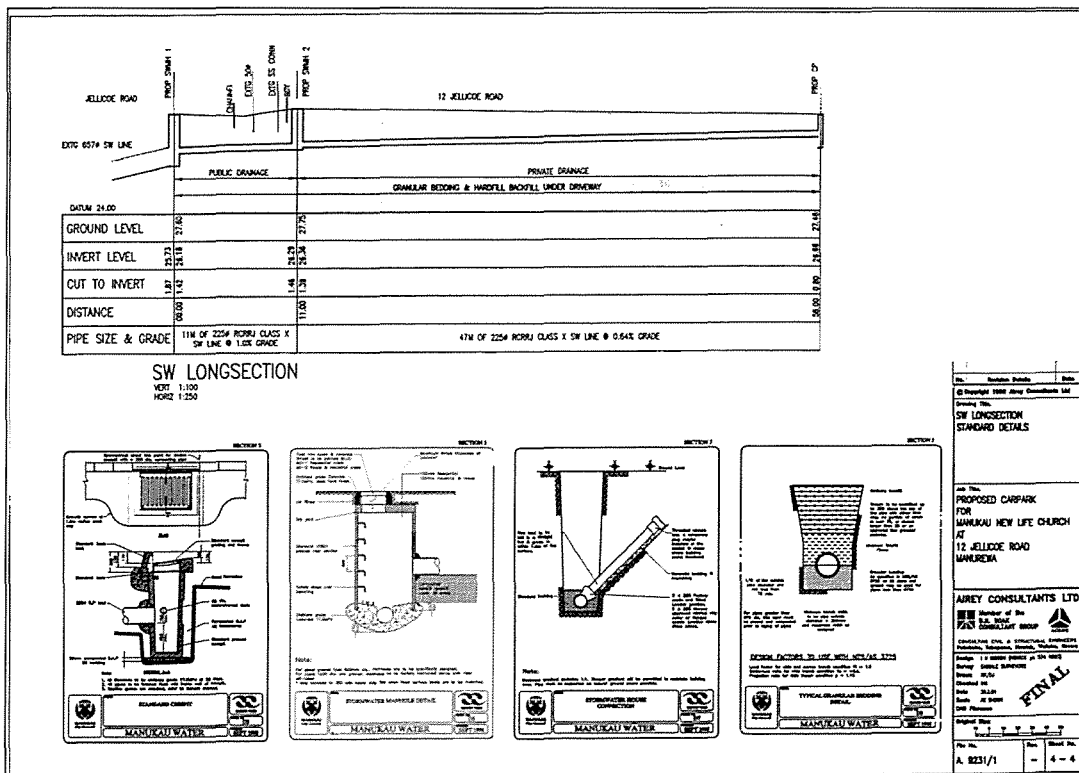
PROPOSED STORMWATER DRAINAGE CONNECTION
